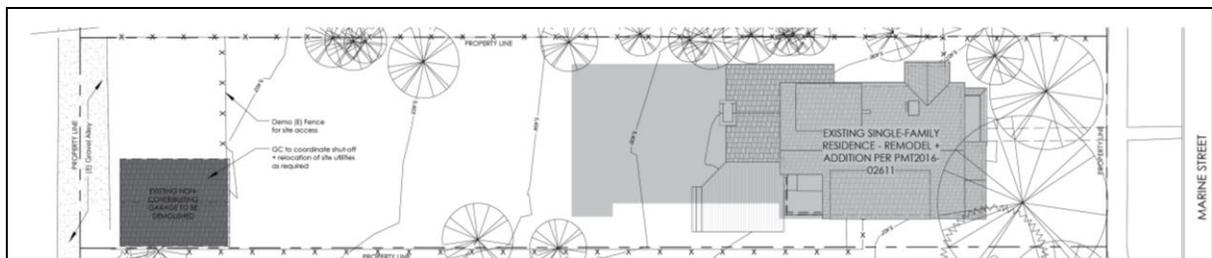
Existing Site Plan, with footprint of house and approved rear addition (shaded).
